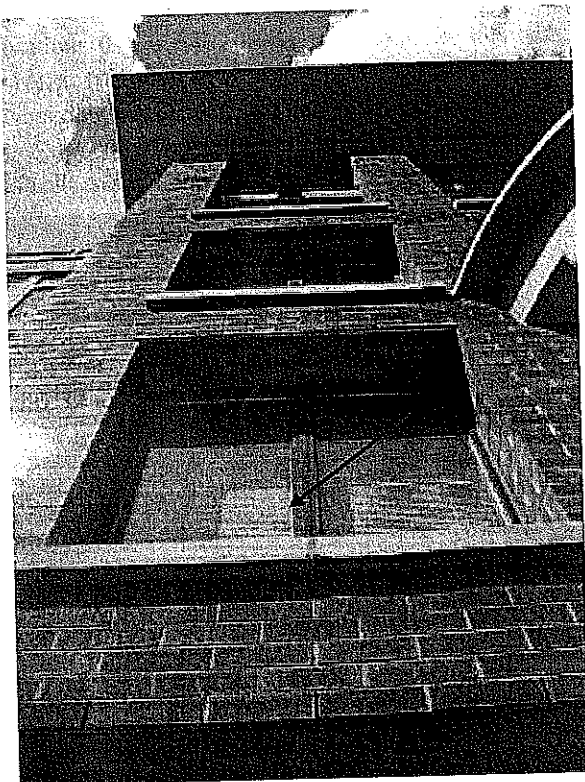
Typical punched window assembly. Red arrow shows mortar joint between precast elements. Note that the joint is not sealed.
